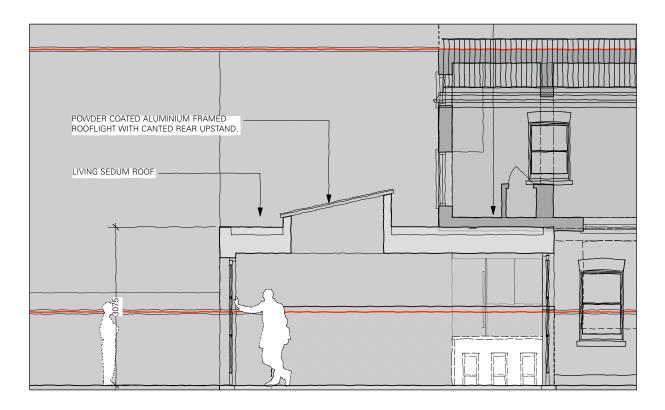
Proposed Section Rear Extension (not to scale) - 2019.
